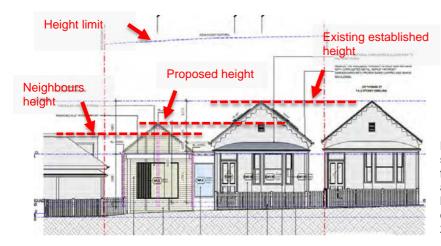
Front elevation showing consistent stepdown of form and massing. The proposed additions are smaller in scale and height at the existing house and offers appropriate transition with 22 Thomas Street.
